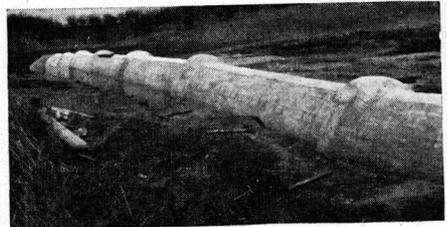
Reinforced Concrete Arch Culvert Prior to Construction of Fill
